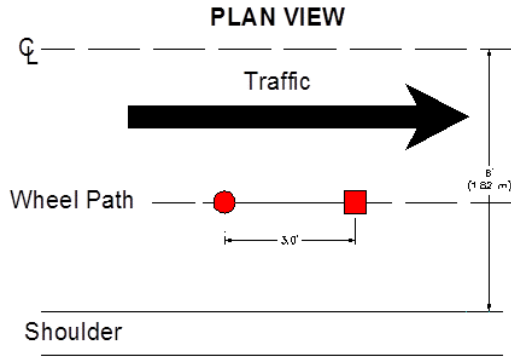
Illustration. Plan view detail of rosettes instrumentation for Sections A and B.
